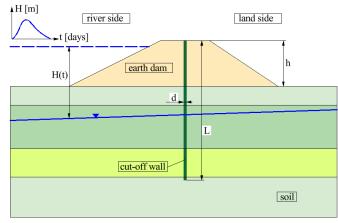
Schematic cross section of the earth dam with vertical cutoff wall.
